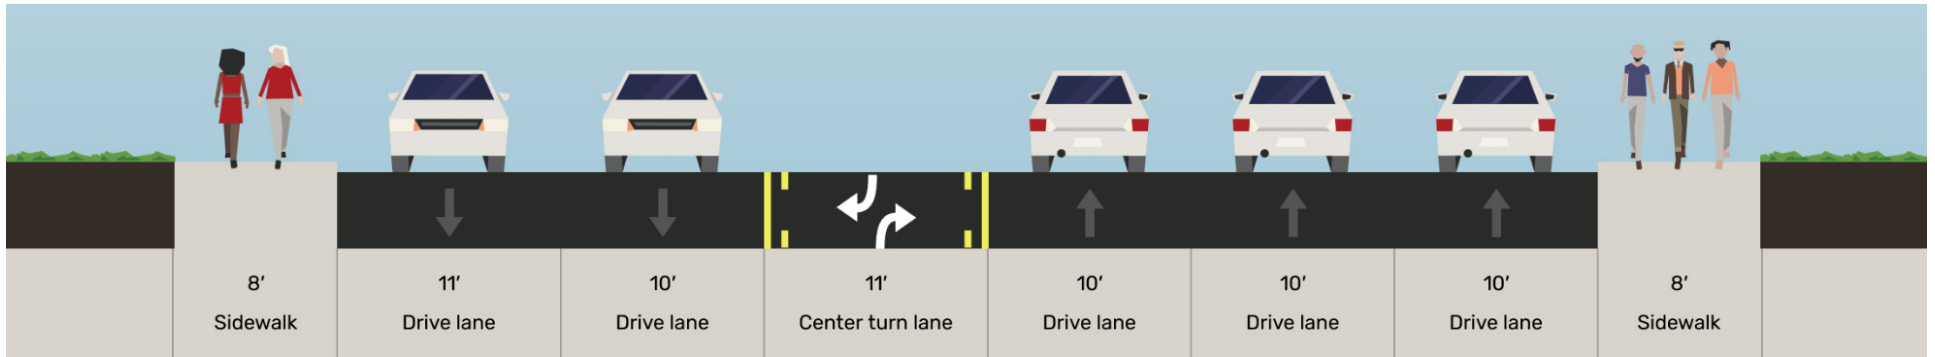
Existing cross-section: W 120th St from Crenshaw Blvd to the Laguna Dominguez Trail
